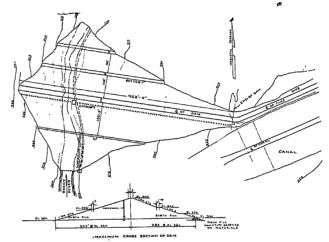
Plan and Cross-Section of the Main Earth Dam
